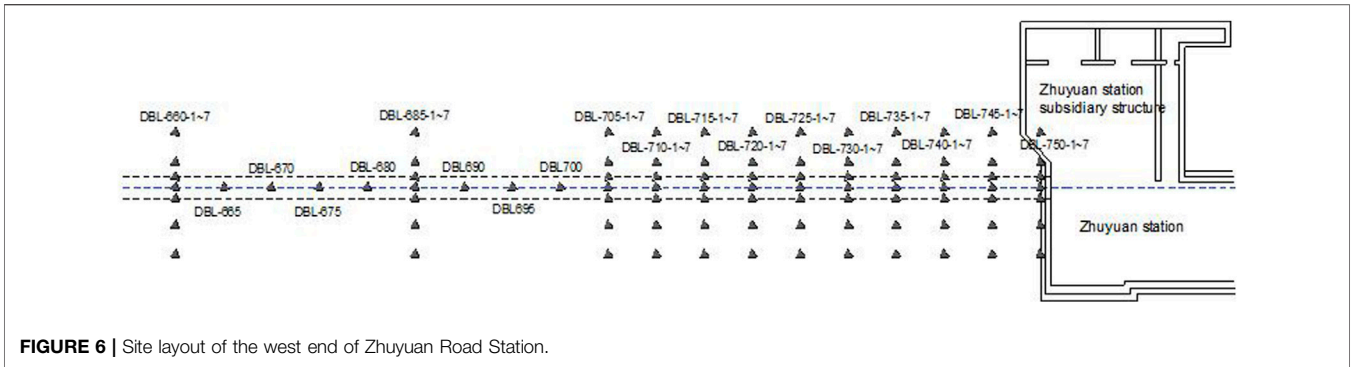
| Site layout of the west end of Zhuyuan Road Station.
